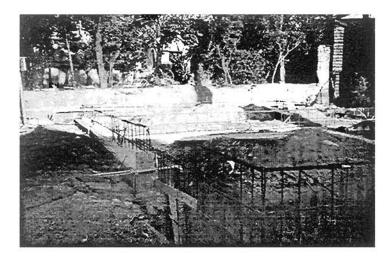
A house foundation with reinforcements found in Nishinomiya
